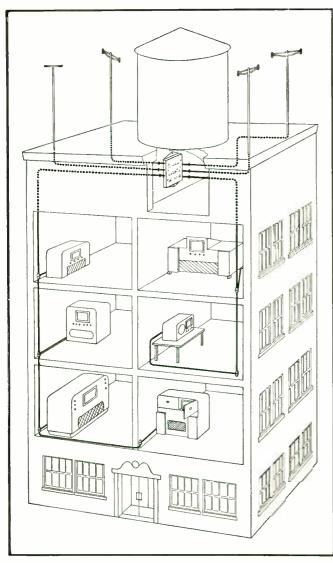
Line drawing of a moderate-size apartment building showing a typical layout of antennas, amplifier, and outlets used by the Intra-Video Corp. in multiple dwellings.
